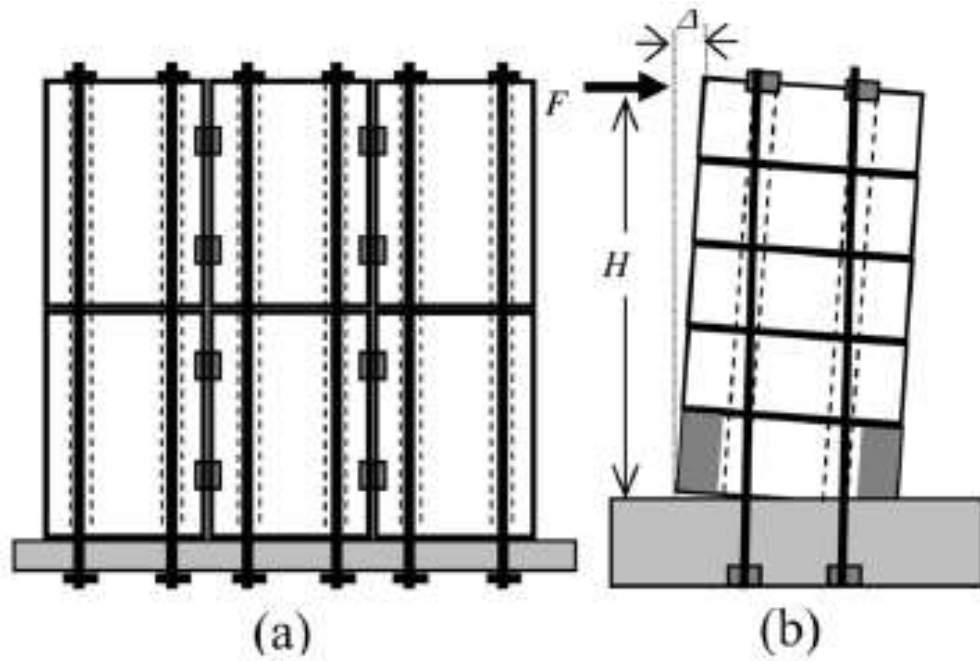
Self-Centering precast concrete wall systems (Seo and Sause 2005)
